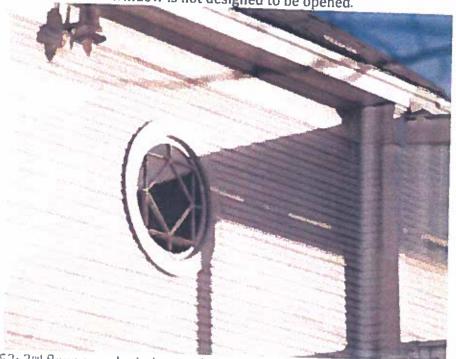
2nd floor round window to the middle room. This window is not designed to be opened.
